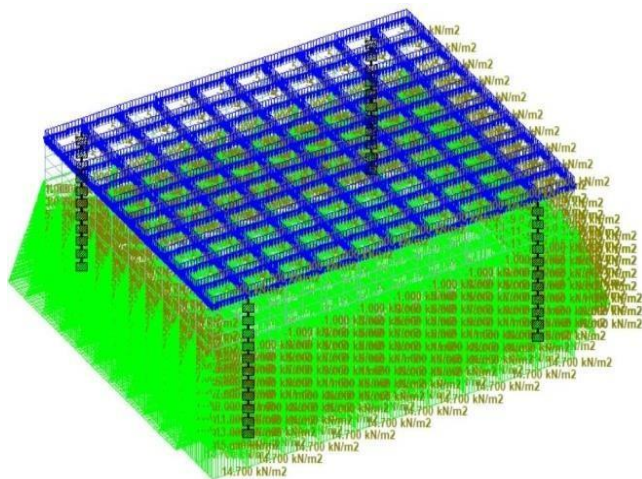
Isometric view of live load and buoyant force on structure at flooding condition.
